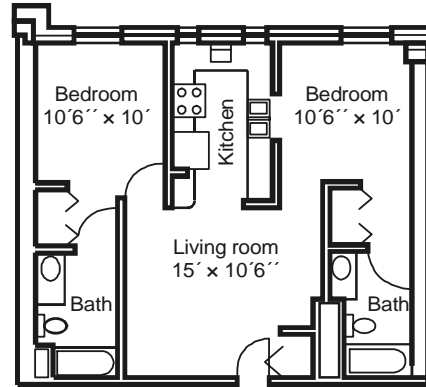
Two bedroom compact apartment plan with all amenities.
